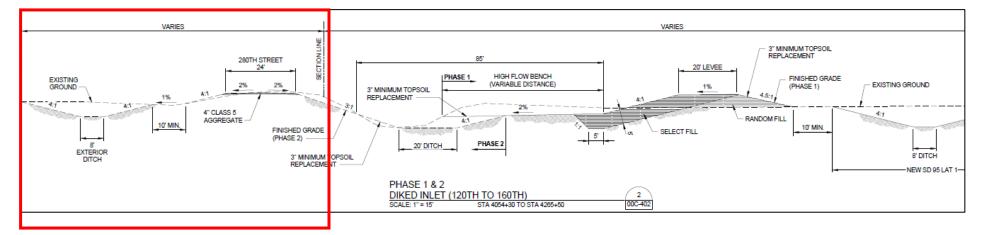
Typical Section of Diked Inlet (Impoundment to 120th Ave) - Altering Existing 280th St
